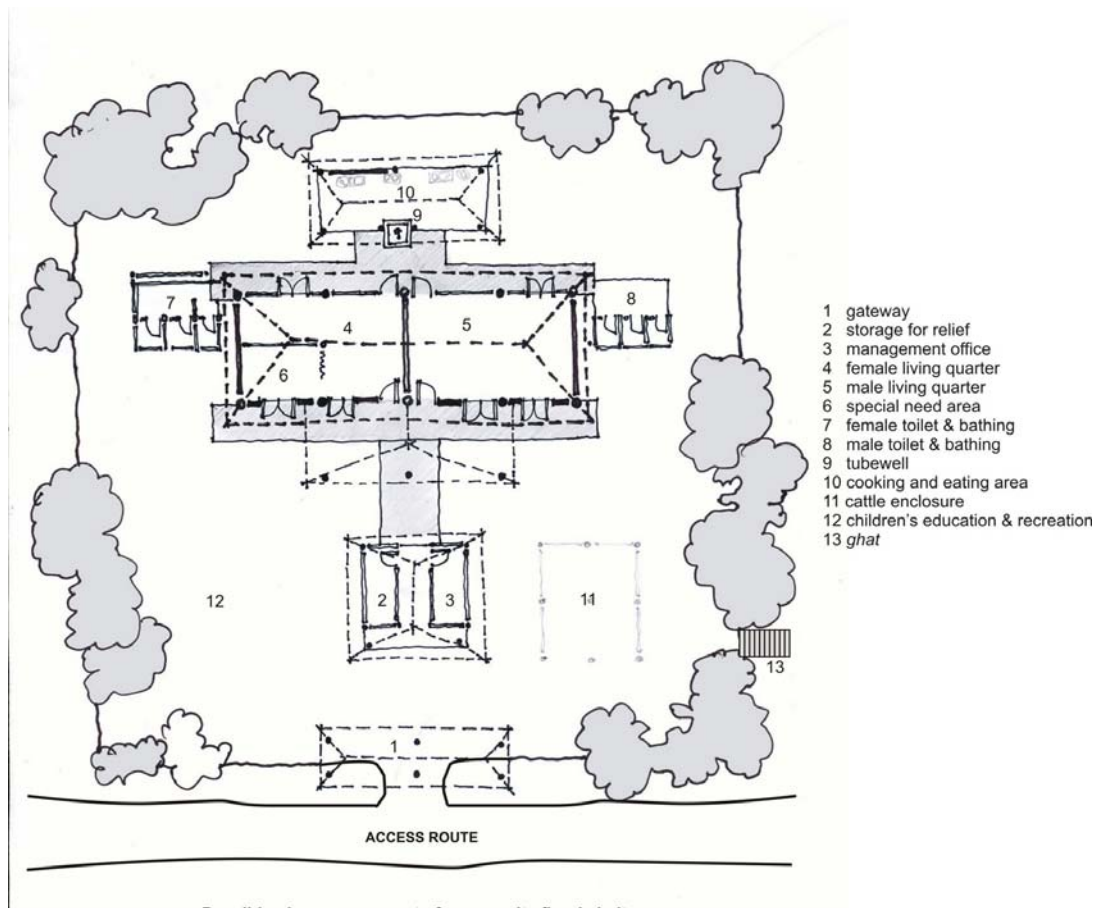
Schematic Plan of a Community Flood Shelter
